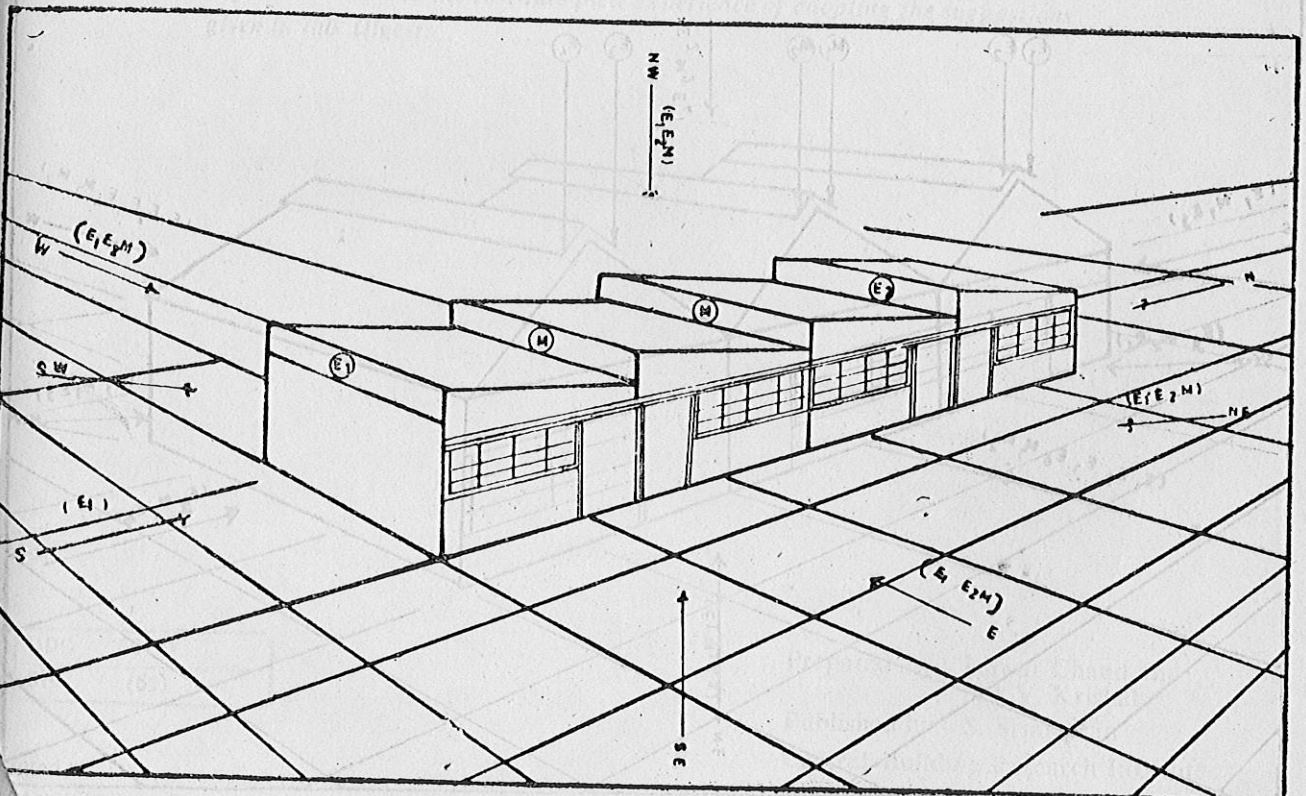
Preferred Location of Roof Openings in Southlight Sheds Having Windows on East & West Walls.
